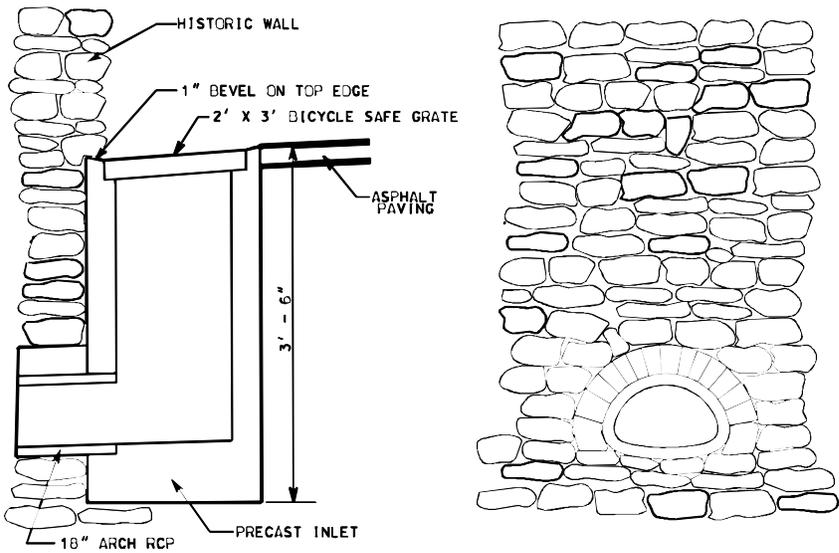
Installation of a drainage inlet on the roadway next to a stone masonry wall
